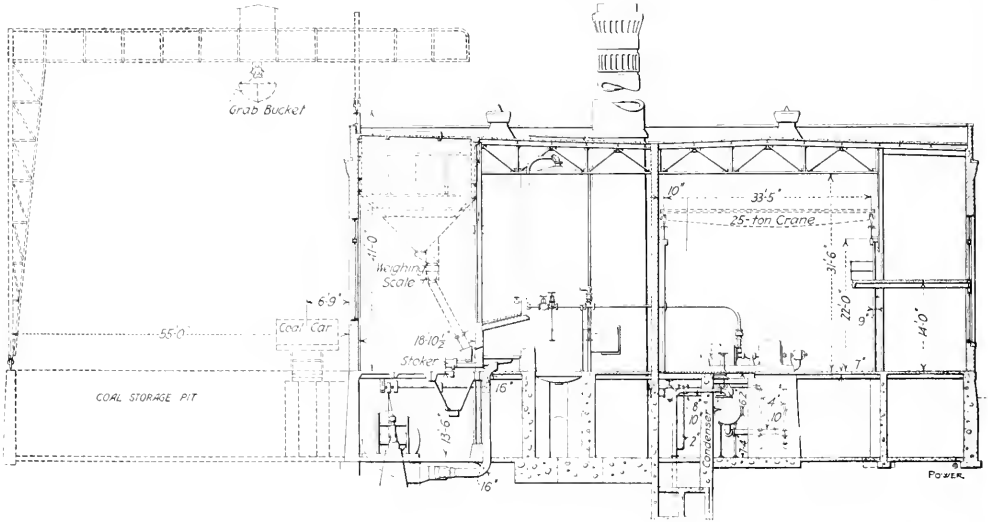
SECTIONAL ELEVATION THROUGH STATION, SHOWING PROPOSED COAL- AND ASH-HANDLING FACILITIES
